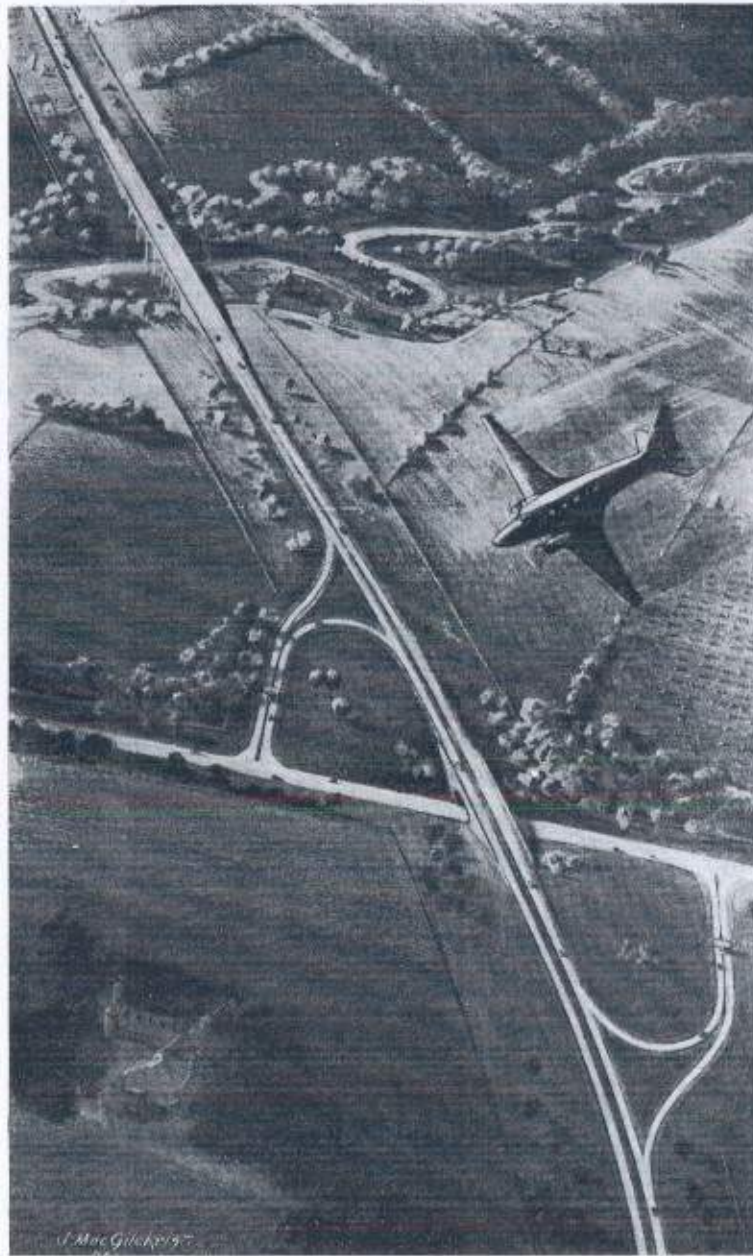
A typical grade separation, access roads, and toll booths for a two-lane road widened to three lanes at the approach to an access point by addition of a central lane of contrasting color and surface texture.
